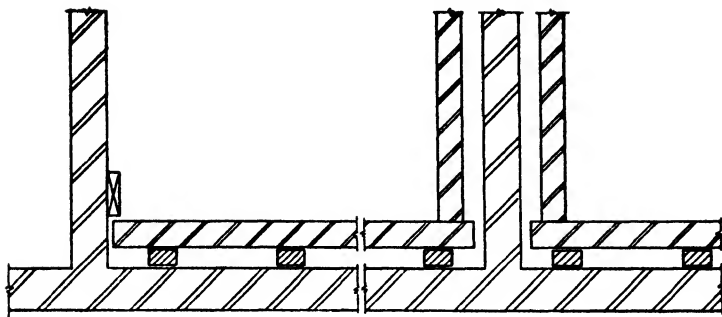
JOINT BETWEEN FLOATING FLOOR AND STRUCTURAL WALL
